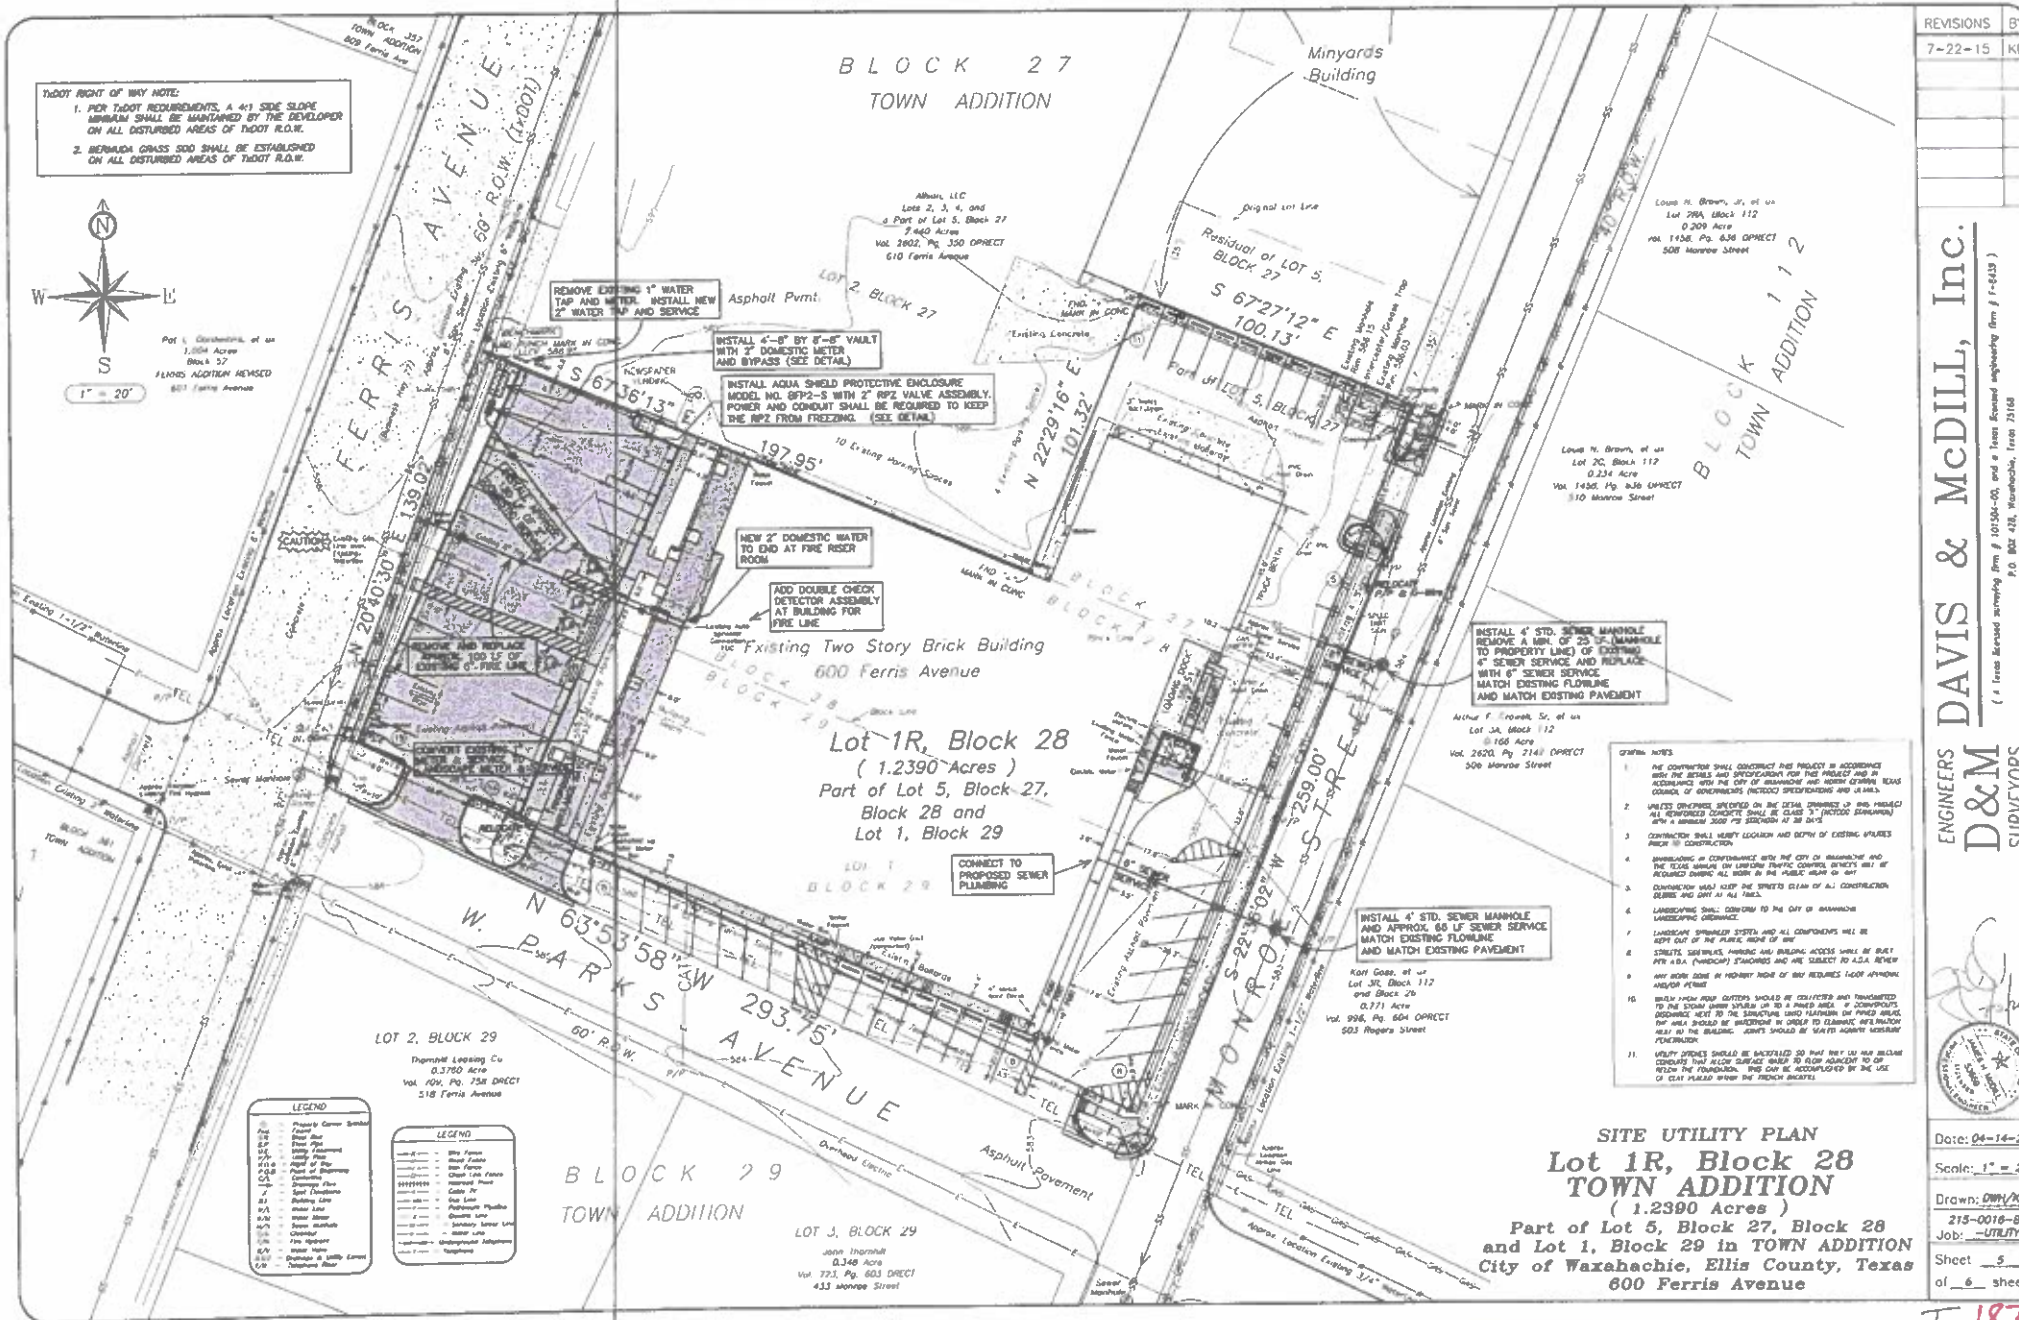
EXHIBIT B - SITE PLAN (EXISTING CONDITIONS)
